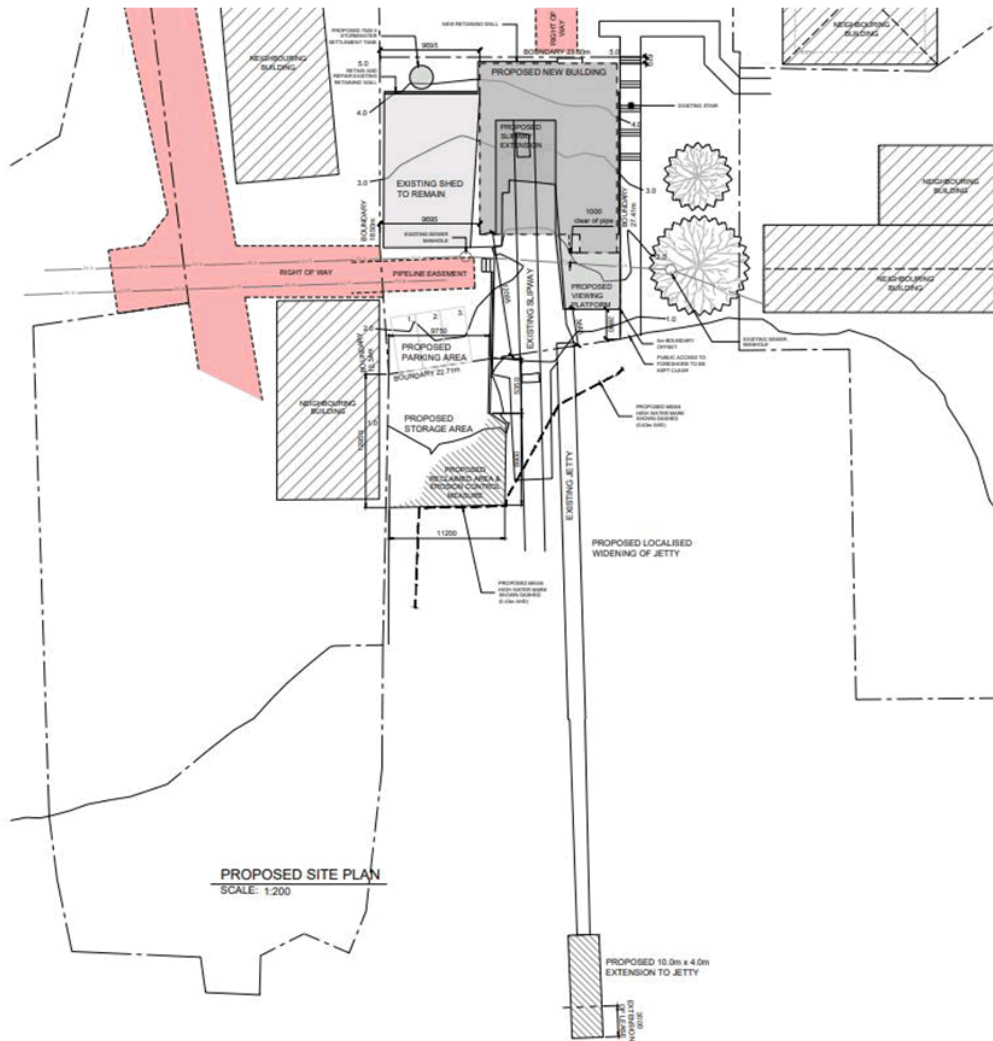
Proposed site layout (the subject site outlined in red). M Fletcher Drawing A001.
